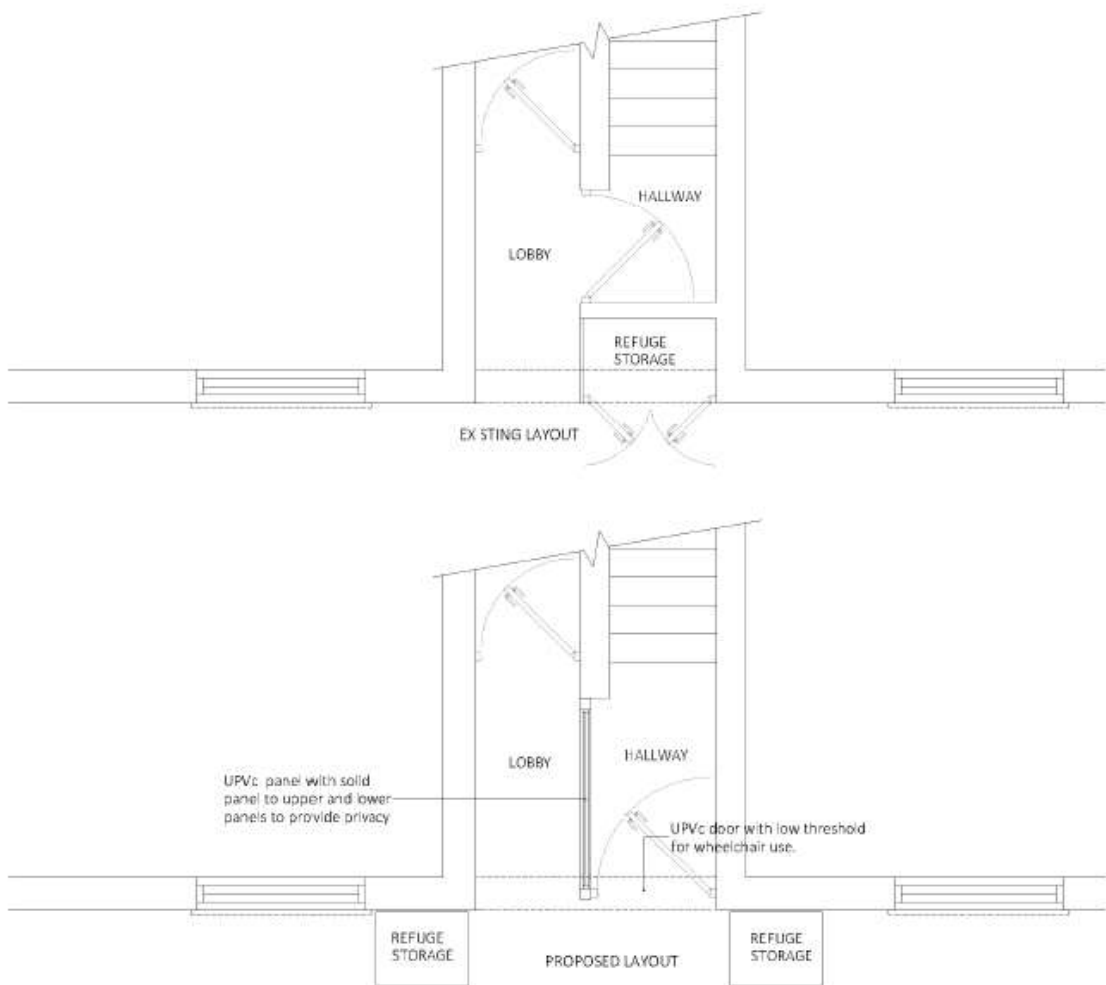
Proposed Floorplan (please note – larger version of plan can be found in the Committee Plan Pack)
